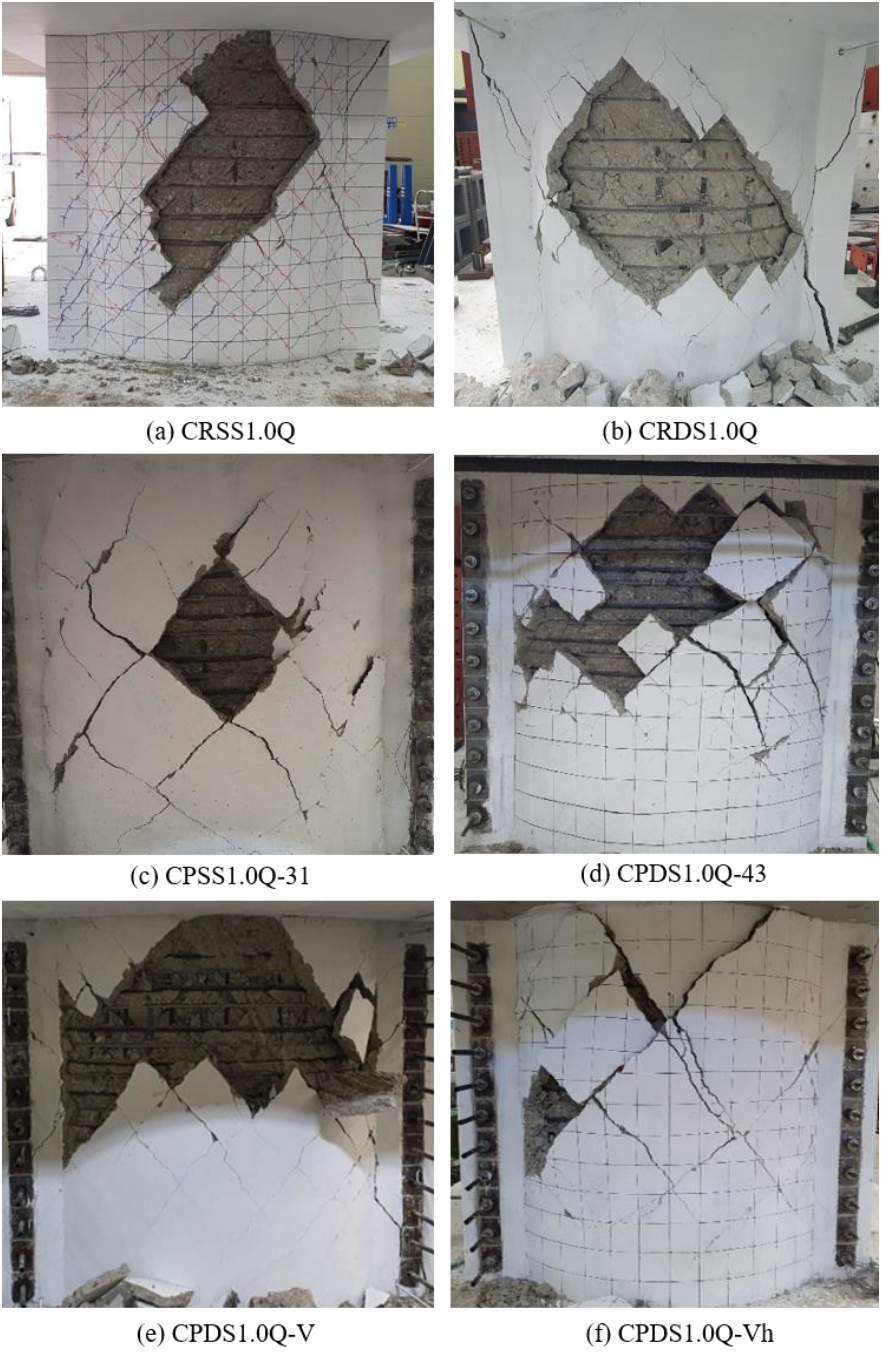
Failure modes of cylindrical shape specimens (front view)
